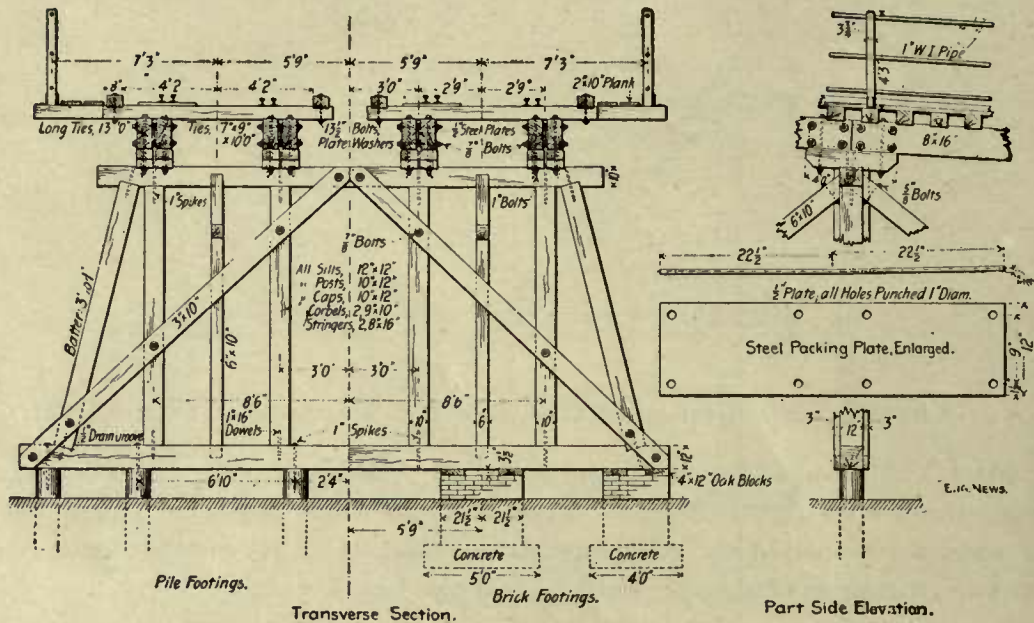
PLATE XLVIII.—ATLANTIC HIGHLANDS, RED BANK & LONG BRANCH ELECTRIC RAILWAY.
